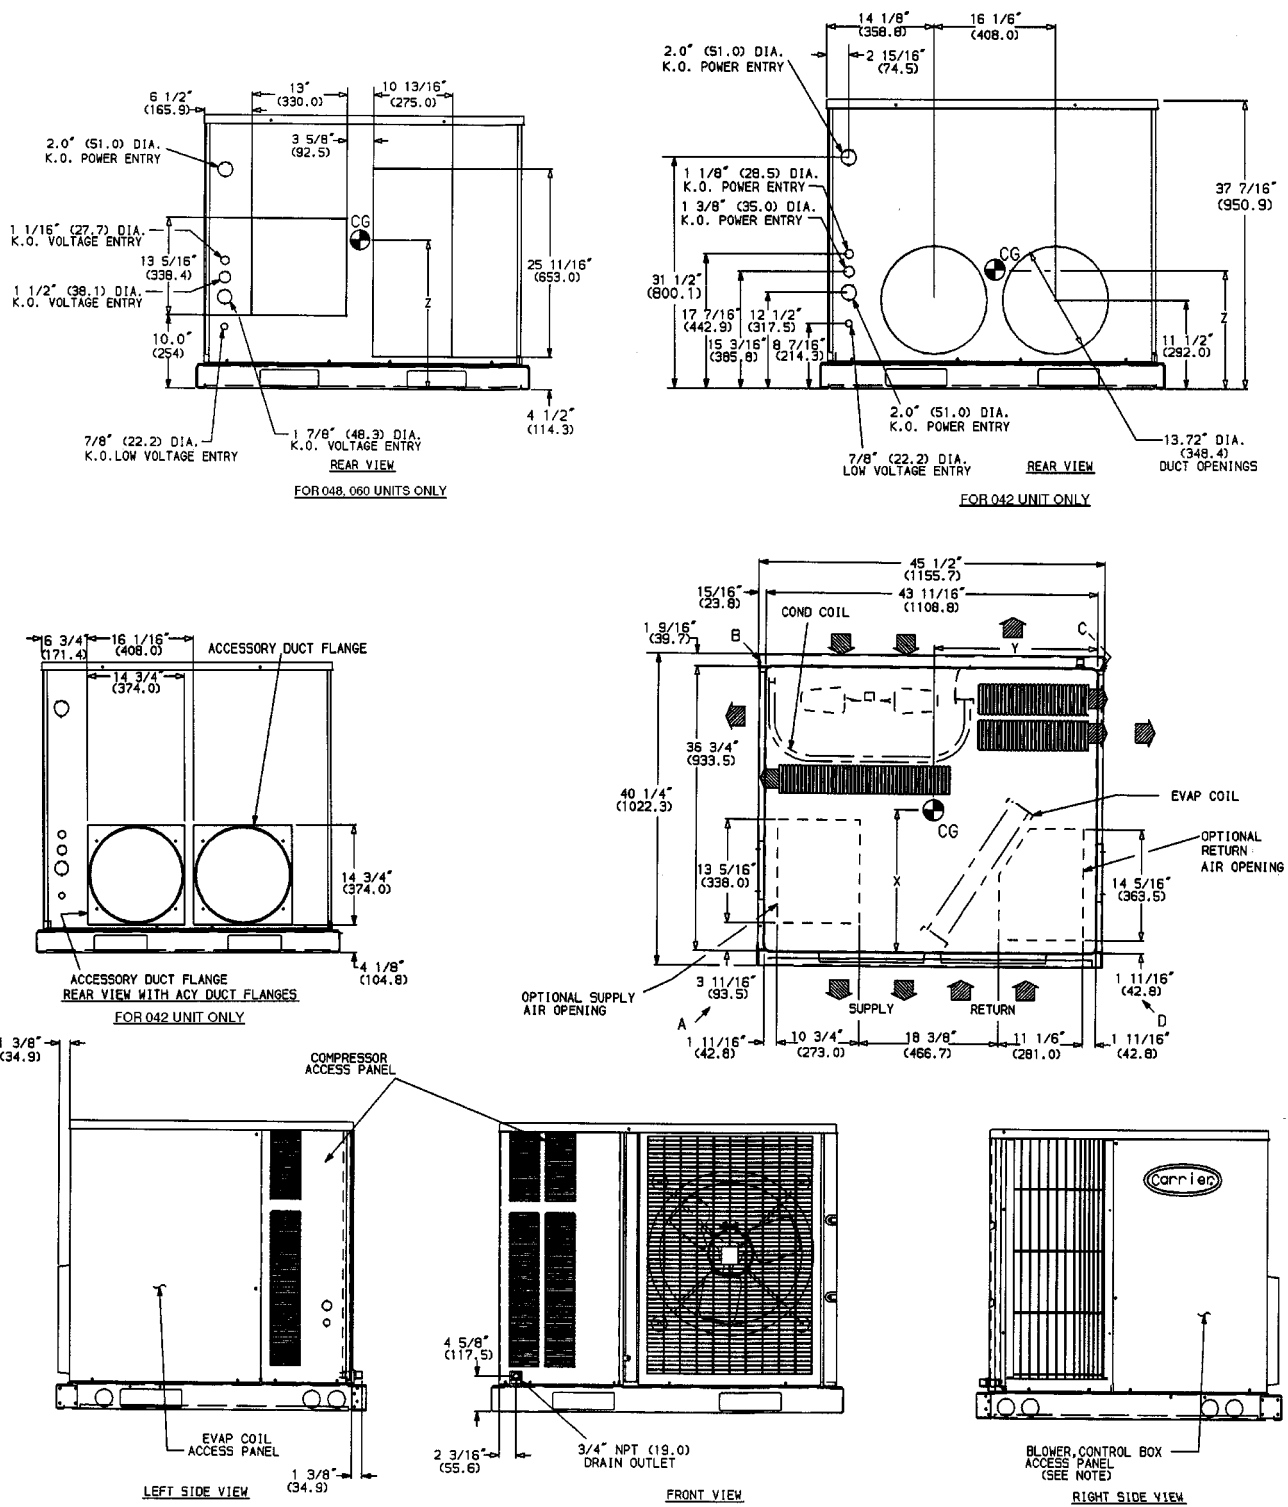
Dimensions; Units 50SX042-060 With Optional Base Rail
